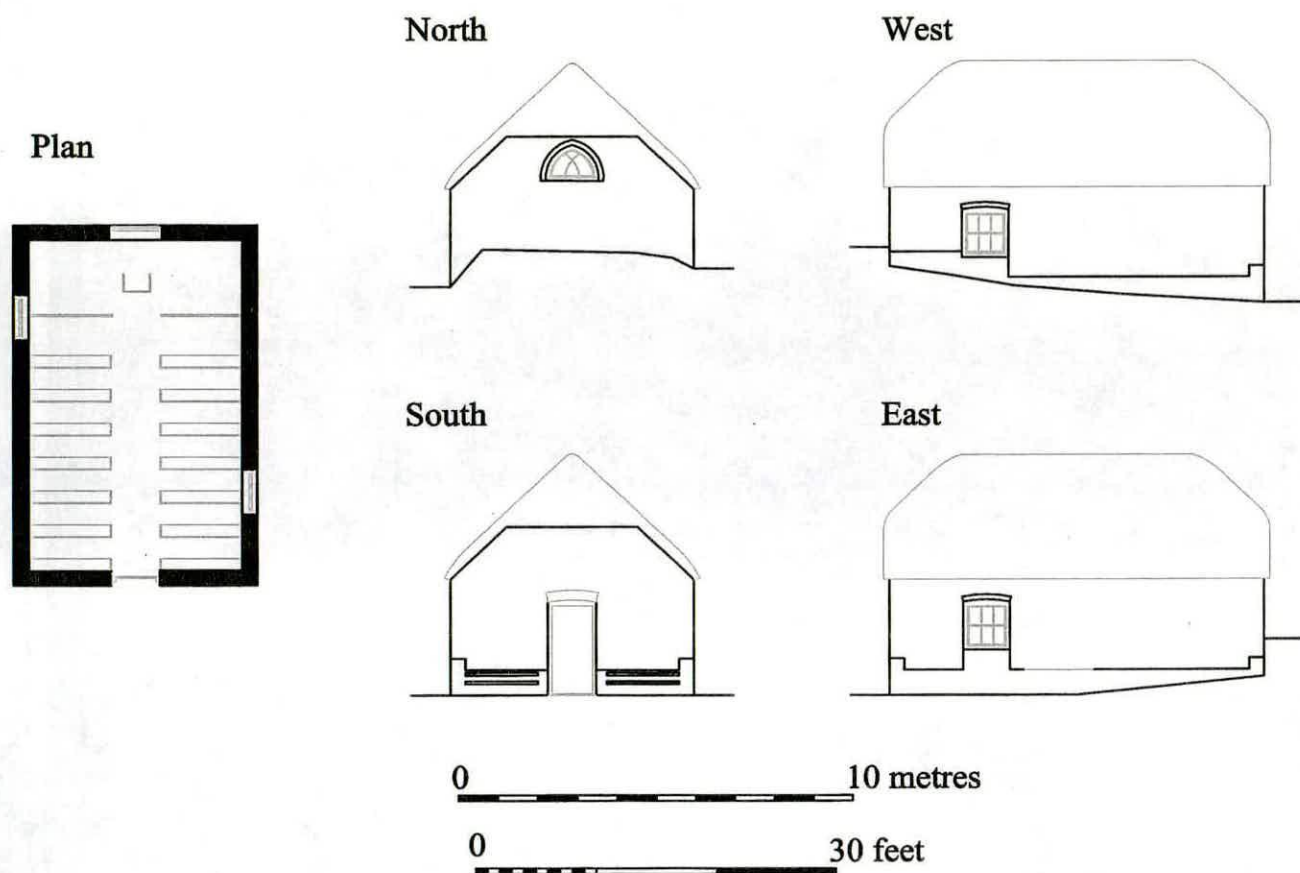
Sketch plan and restored elevations of the chapel. The conjectural elements, including a suggestion of the possible pew arrangements and the roof form, are shown in grey.
